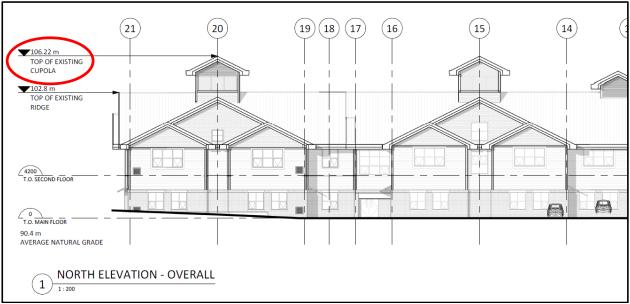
North Elevation illustrating Height of Constructed Cupola
